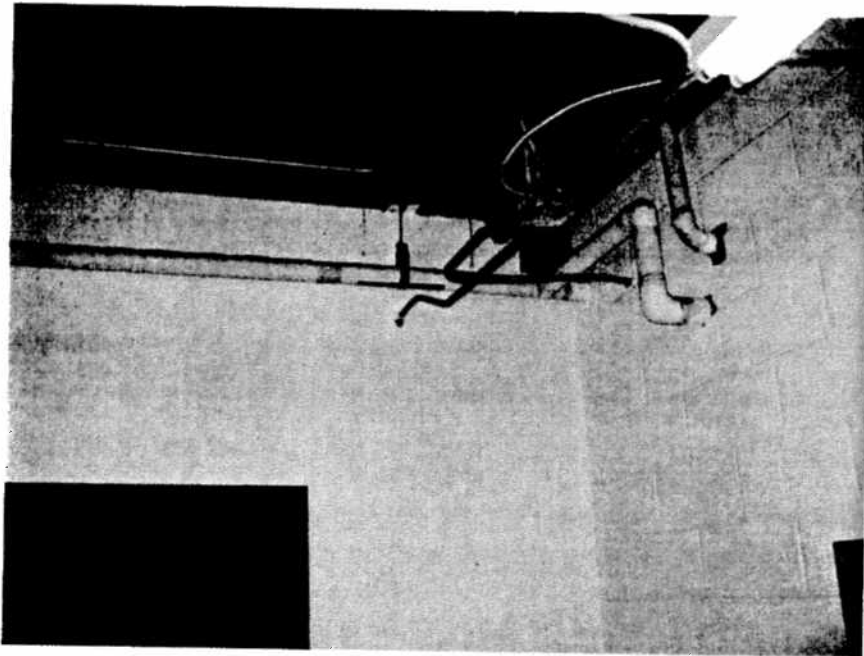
Suspect ACM seen in pipe wrap insulation in heating system room in west wing of the building.
